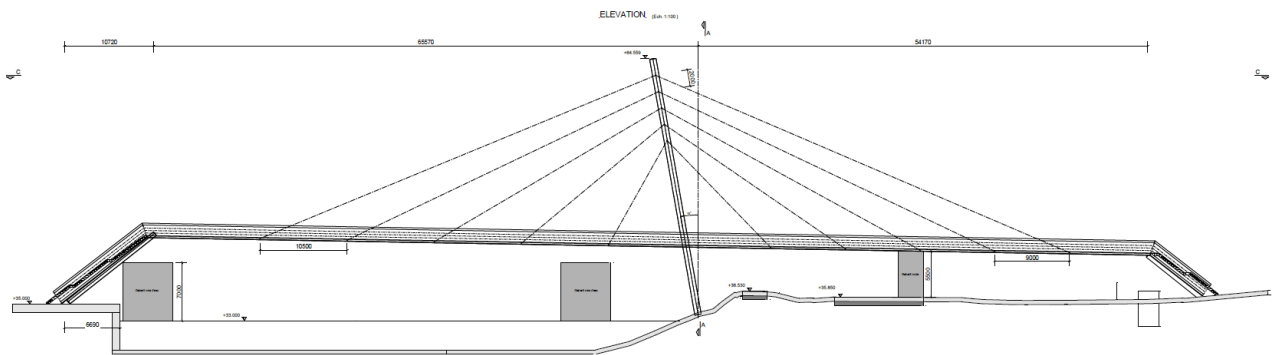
Pre-Design Proposal 1 - Cable Stayed Bridge - Steel and Concrete – Bureau Greisch
